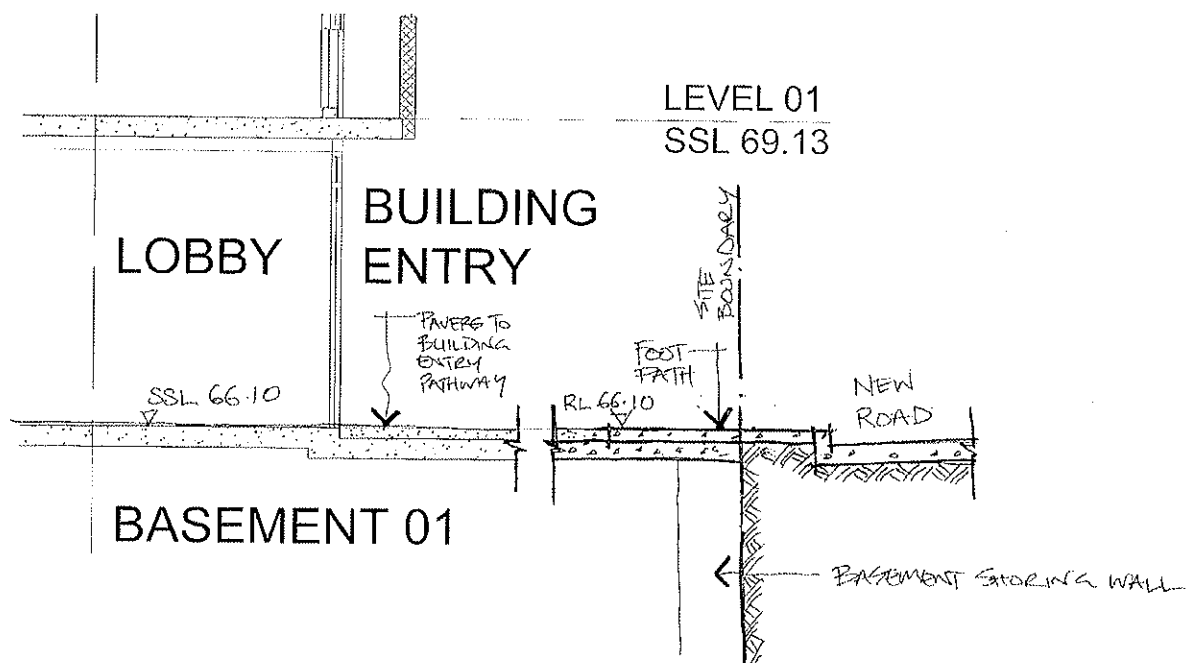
Relationship of road, footpath and proposed level of building lobby.
